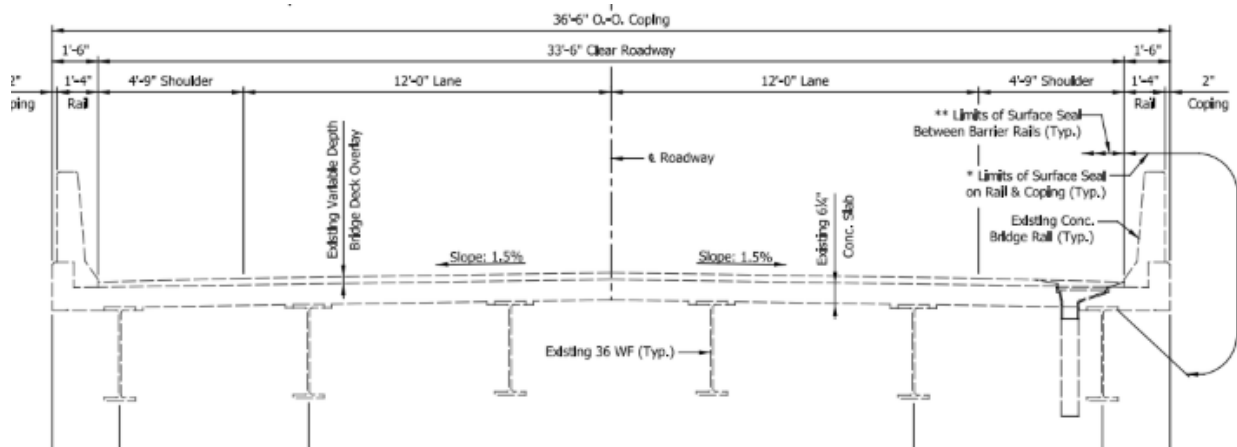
Typical Section of Spans 1-4 and 8-13 of the Bridge (NBI 33240) (2014)
